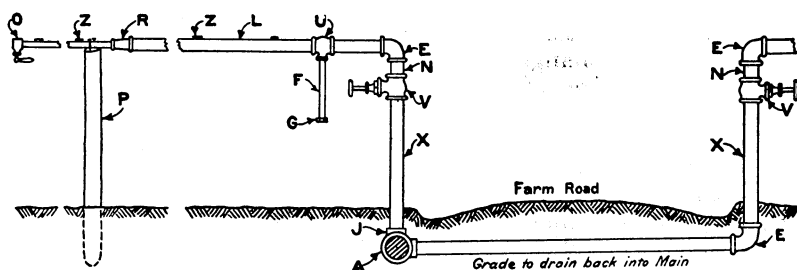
Typical fittings for overhead nozzle lines. A, underground main; J, tee (the one shown has a side opening, used only for connecting beneath the road to another nozzle line); X, upright; V, valve; N, nipple; E, elbow; U, turning union; F, pipe handle for turning line; G, cap on handle; L, nozzle line; Z, brass nozzles; R, reducer connection to smaller pipe; O, cap or flushing cock; P, post support for lines
